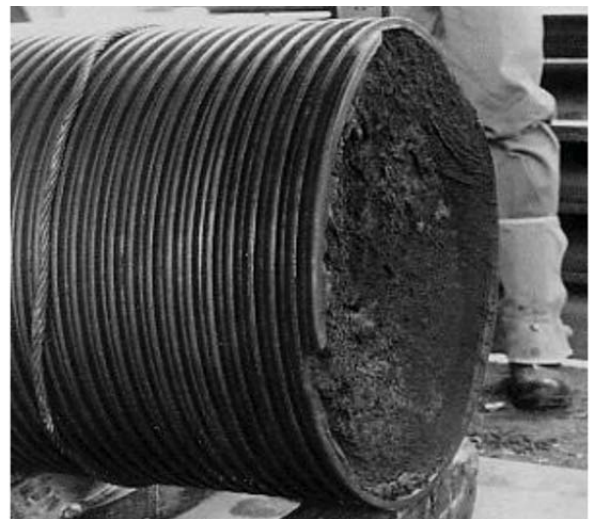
Outer appearance of fracture surface of the tie-rod
